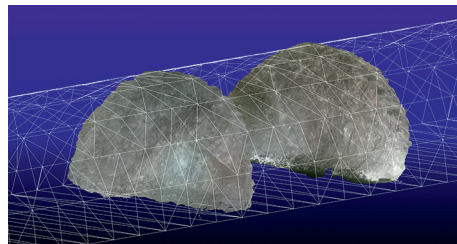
The results of 3D reconstruction in No. 1 Xinan railway tunnel in Jilin.
